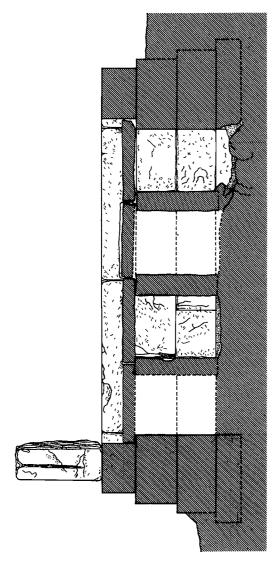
K2, East, north and south elevations, a detail of relieving margin
